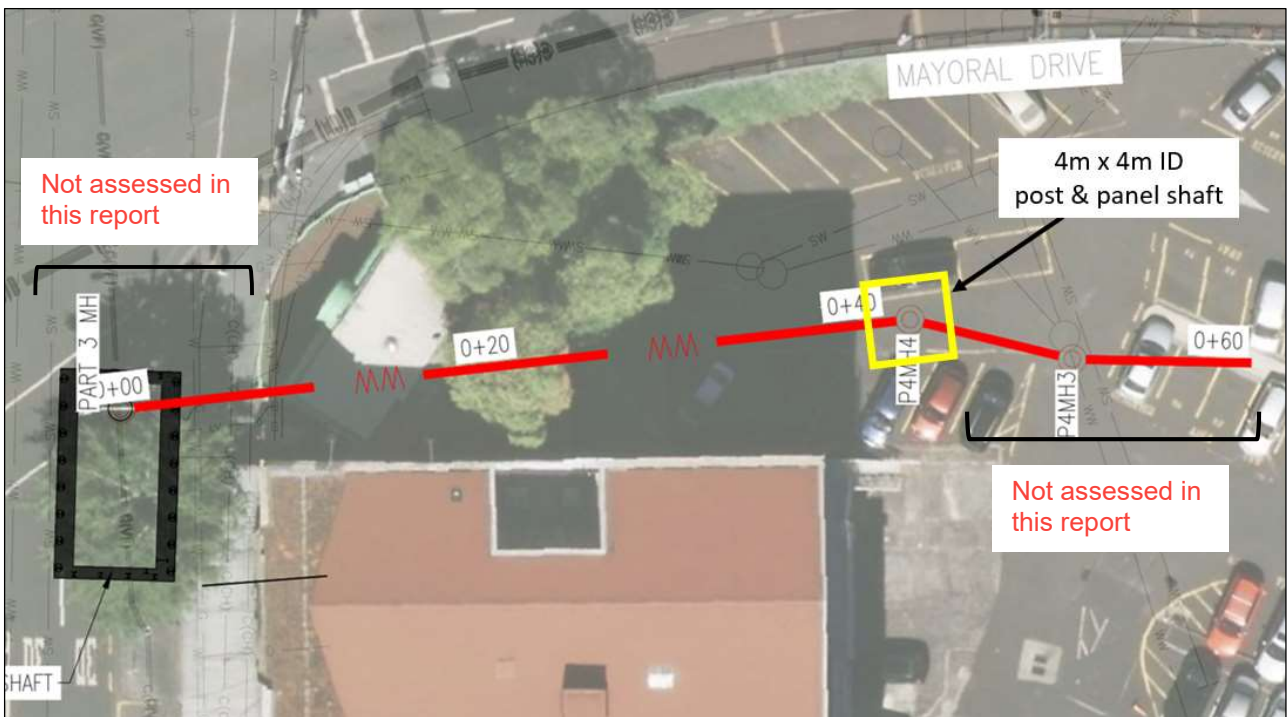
Site plan of the P3-P4 connector tunnel and shaft
